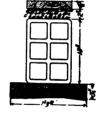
McRoy Tile, 4-Duct Conduit, Class "B" Construction.
